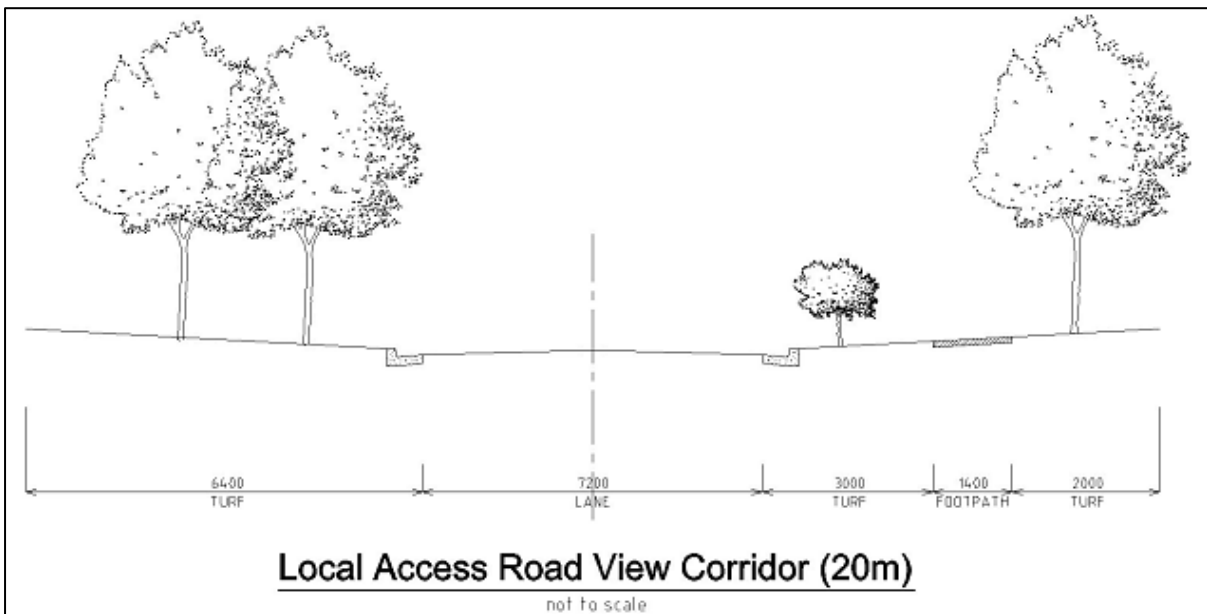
Elderslie Local Access Road View Corridor (20m)
